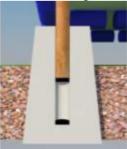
Foundations Home Floating Stage, Hole on Foundations For The Pole Rests Main House
